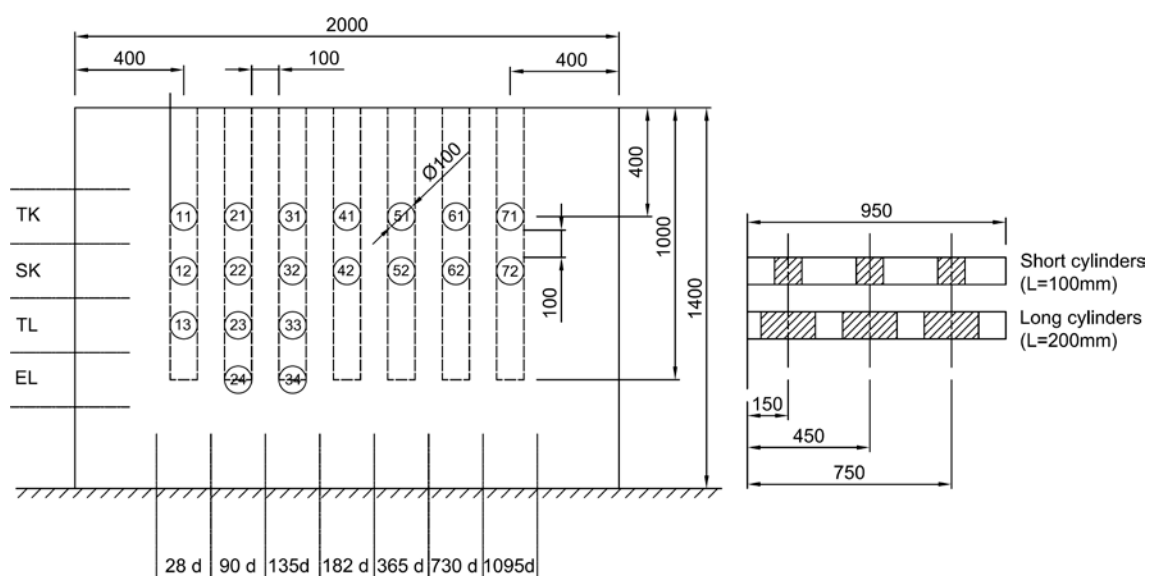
Plan for drilling of horizontal cores from the concrete monolith (left) and extraction of test specimens from the cores (right).
